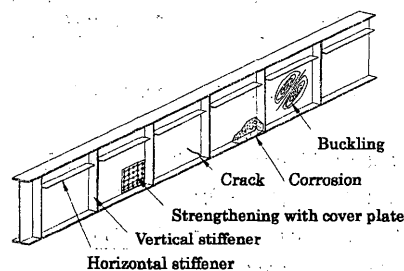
Damage of the steel I-girder bridge and the strengthening.
